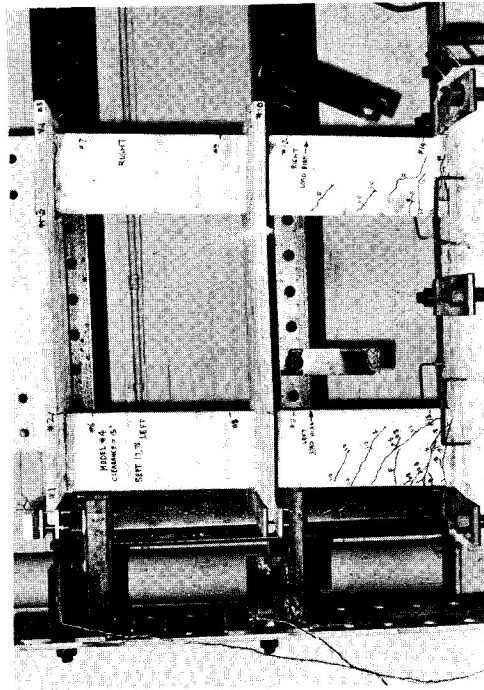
CRACK PATTERN & FAILURE MECHANISM
